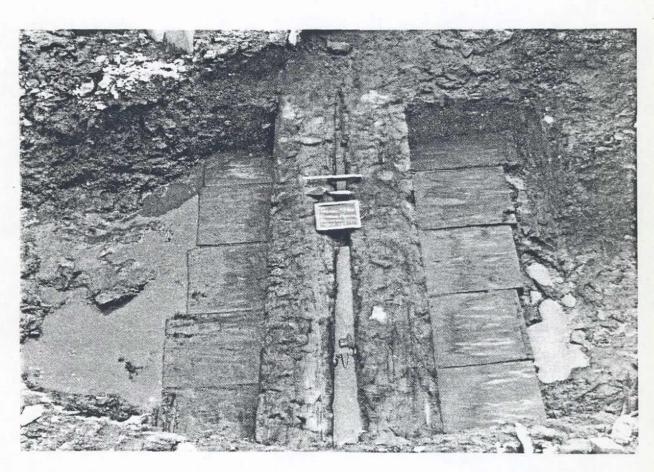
The spread-footer complex under the Lots 40/41 wall.
